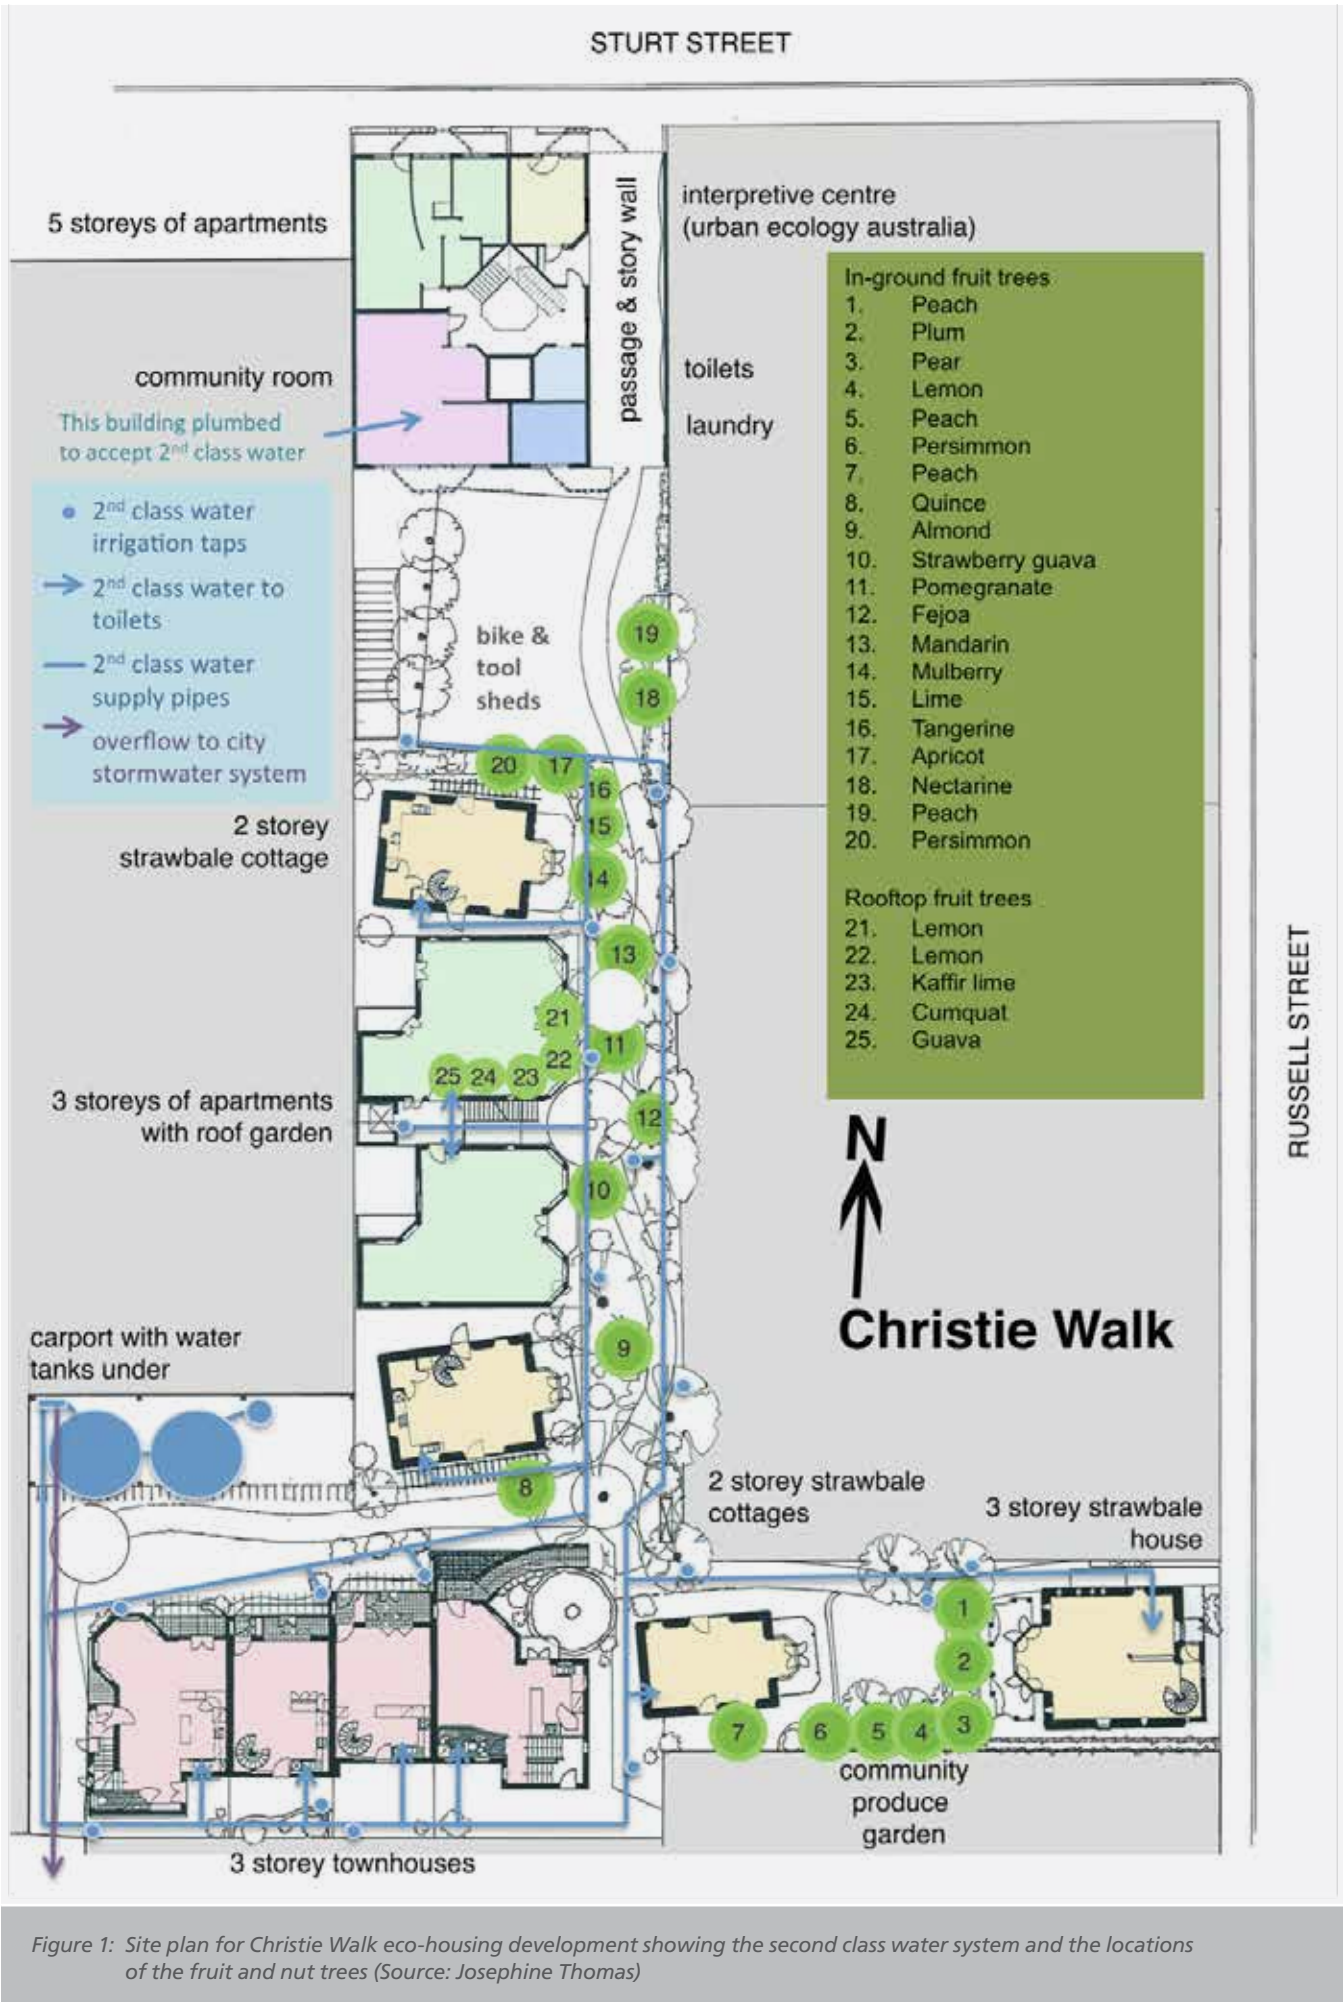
Site plan for Christie Walk eco-housing development showing the second class water system and the locations of the fruit and nut trees (Source: Josephine Thomas)
